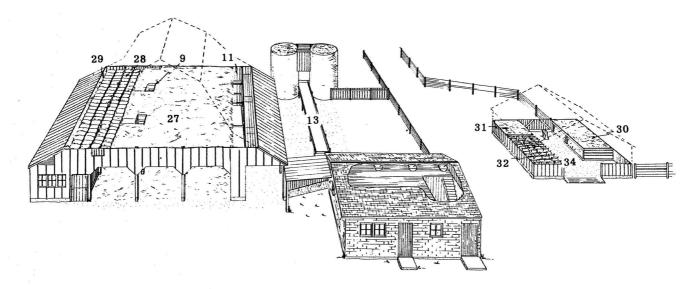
Feed storage and handling in buildings shown in Figure 7. 9—Bedding chute; 11—hay feeding manger; 13—silage feeding bunk; 27—hay storage; 28—bedding storage; 29—straw loft over calf maternity pens; 30—corn; 31—oats; 32—supplements; 34—mixing floor.
